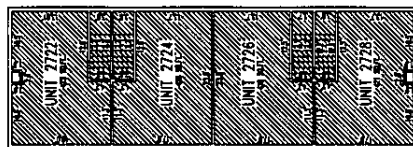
# EXHIBIT B - CONDOMINIUM FLOOR PLAN
